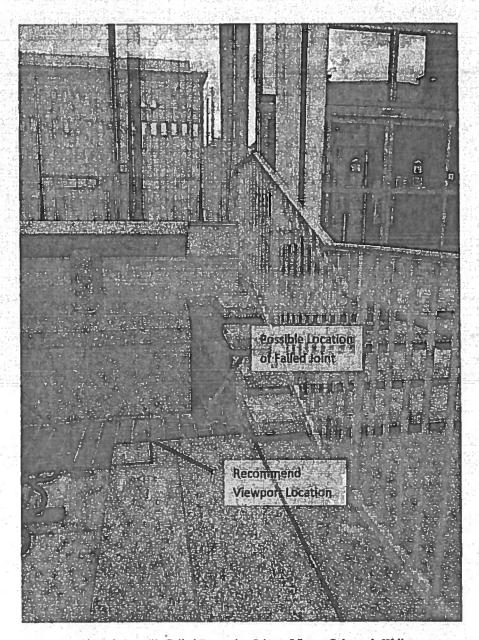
Item #2- Failed Expansion Joint at Library Colonnade Wall
